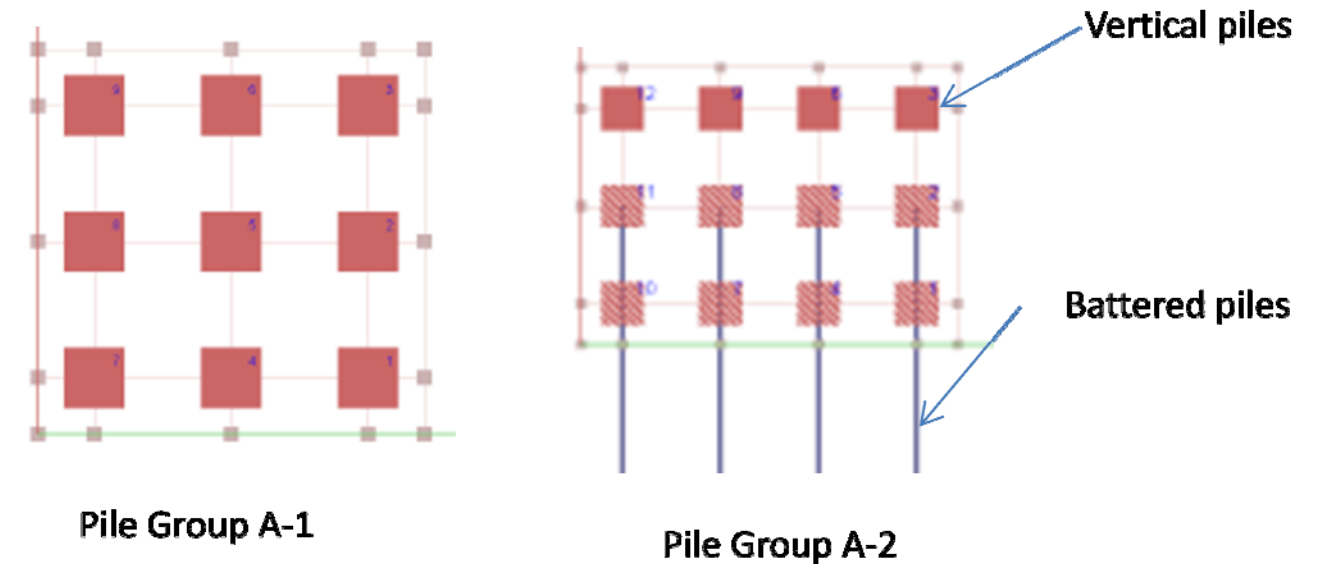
SCHEMATIC DRAWINGS OF PILE GROUPS A-1 AND A-2
